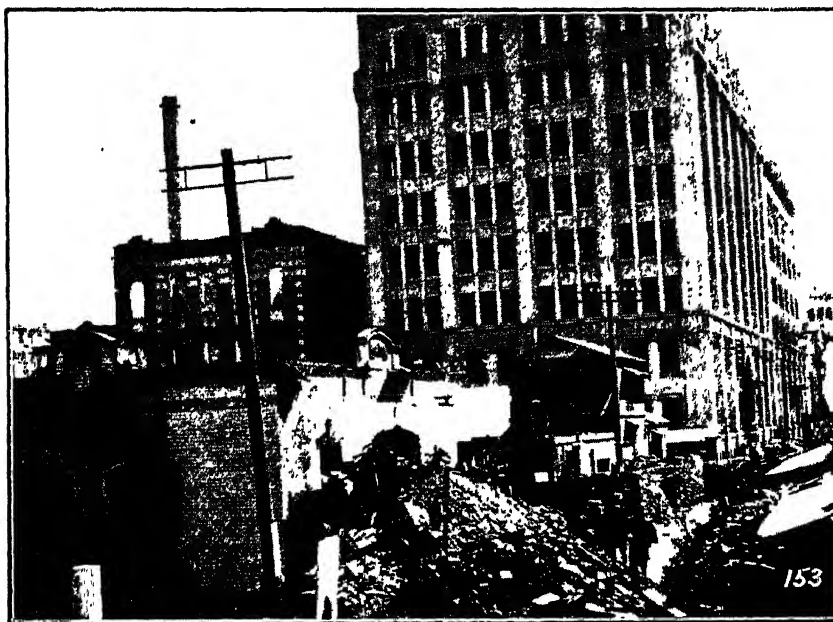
MITSUI BUILDING, TOKYO, JAPAN.
